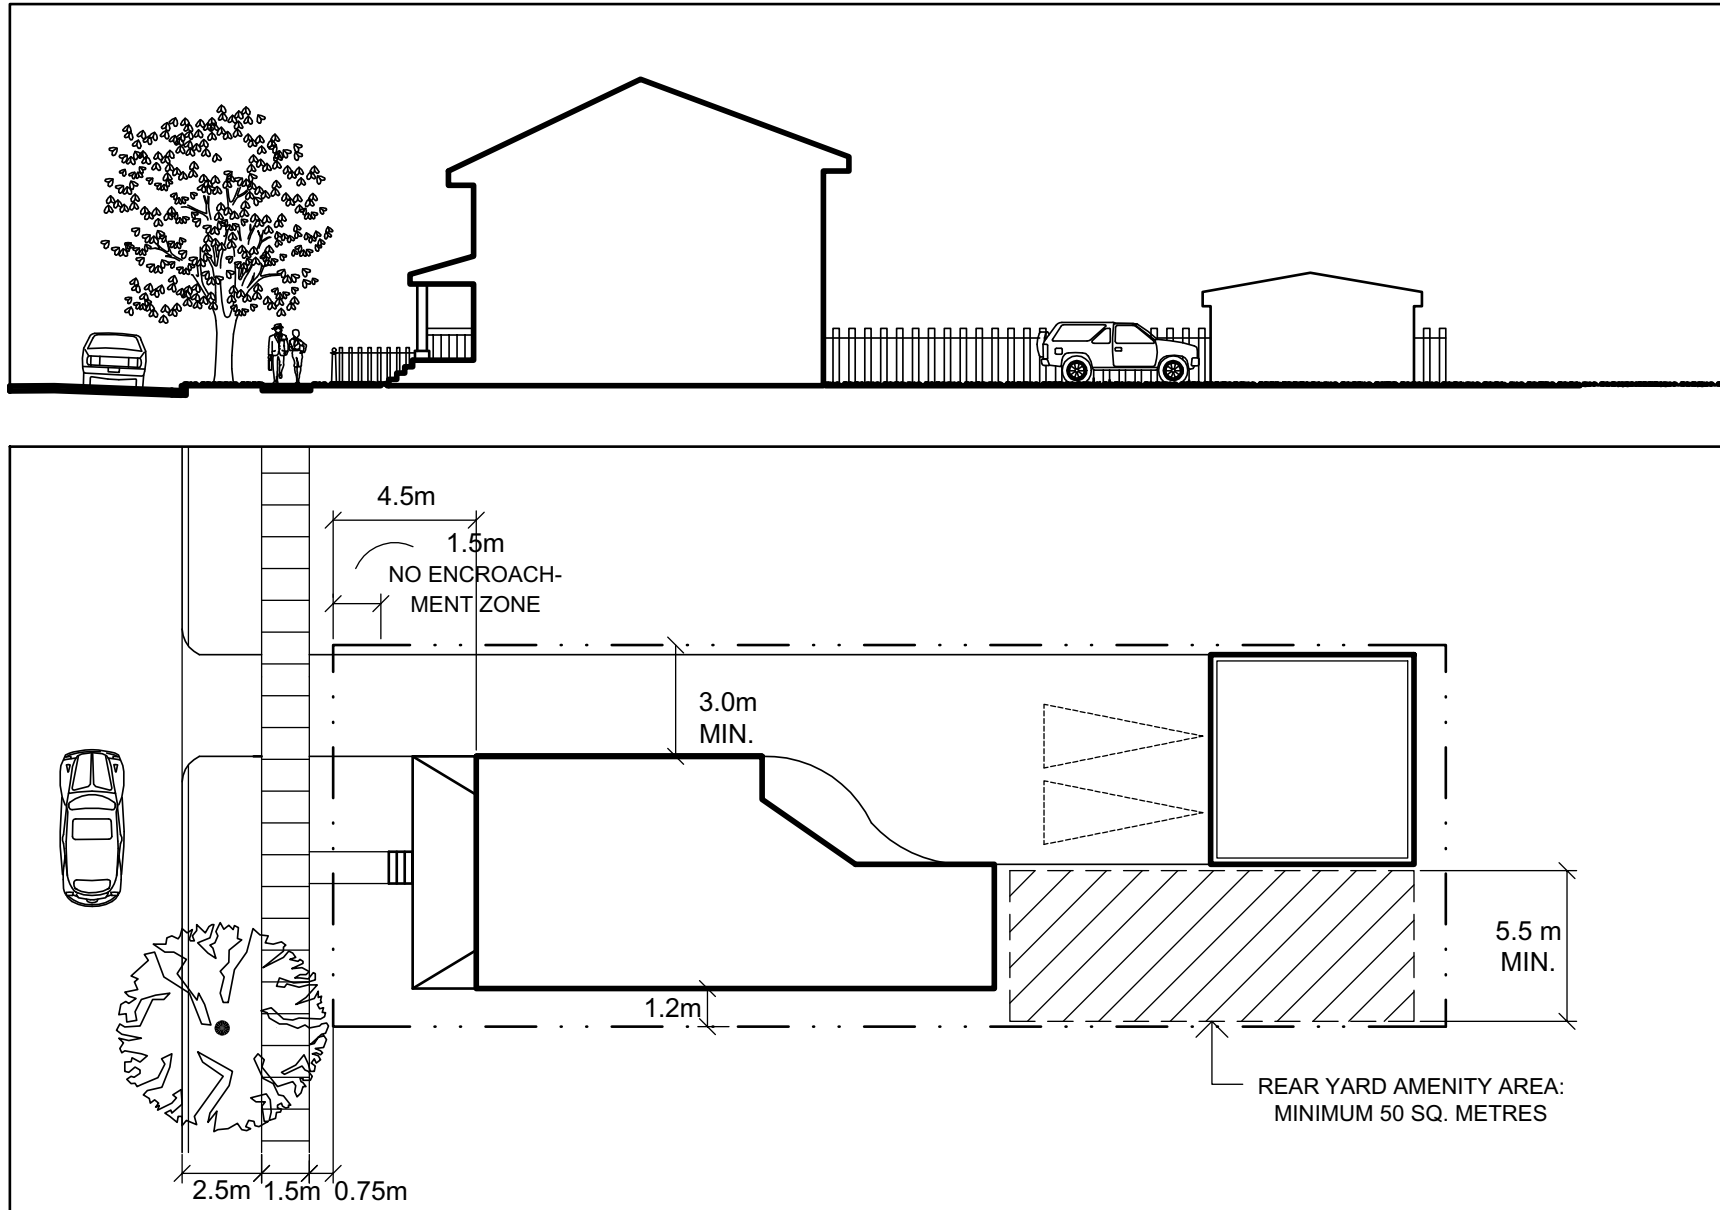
Interior lot with detached garage (4.5m front yard setback / 1.5m no encroachment zone)
